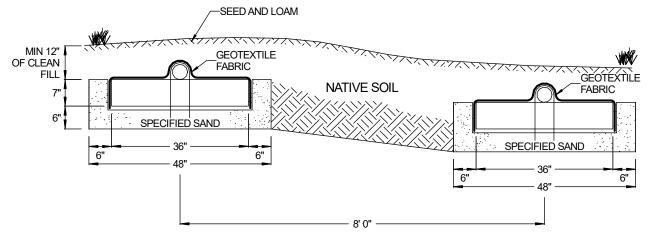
SECTION VIEW – TRENCH SYSTEM – SLOPING SITE
